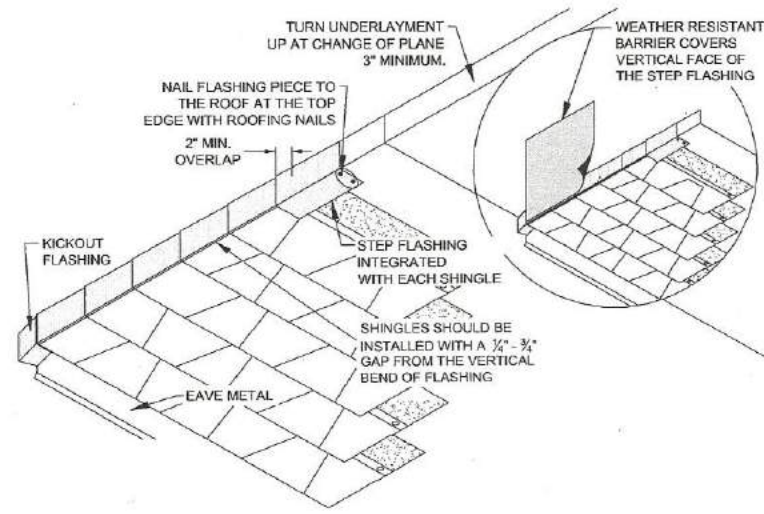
Step Flashing Application at Roof-to-Sidewall Transitions
